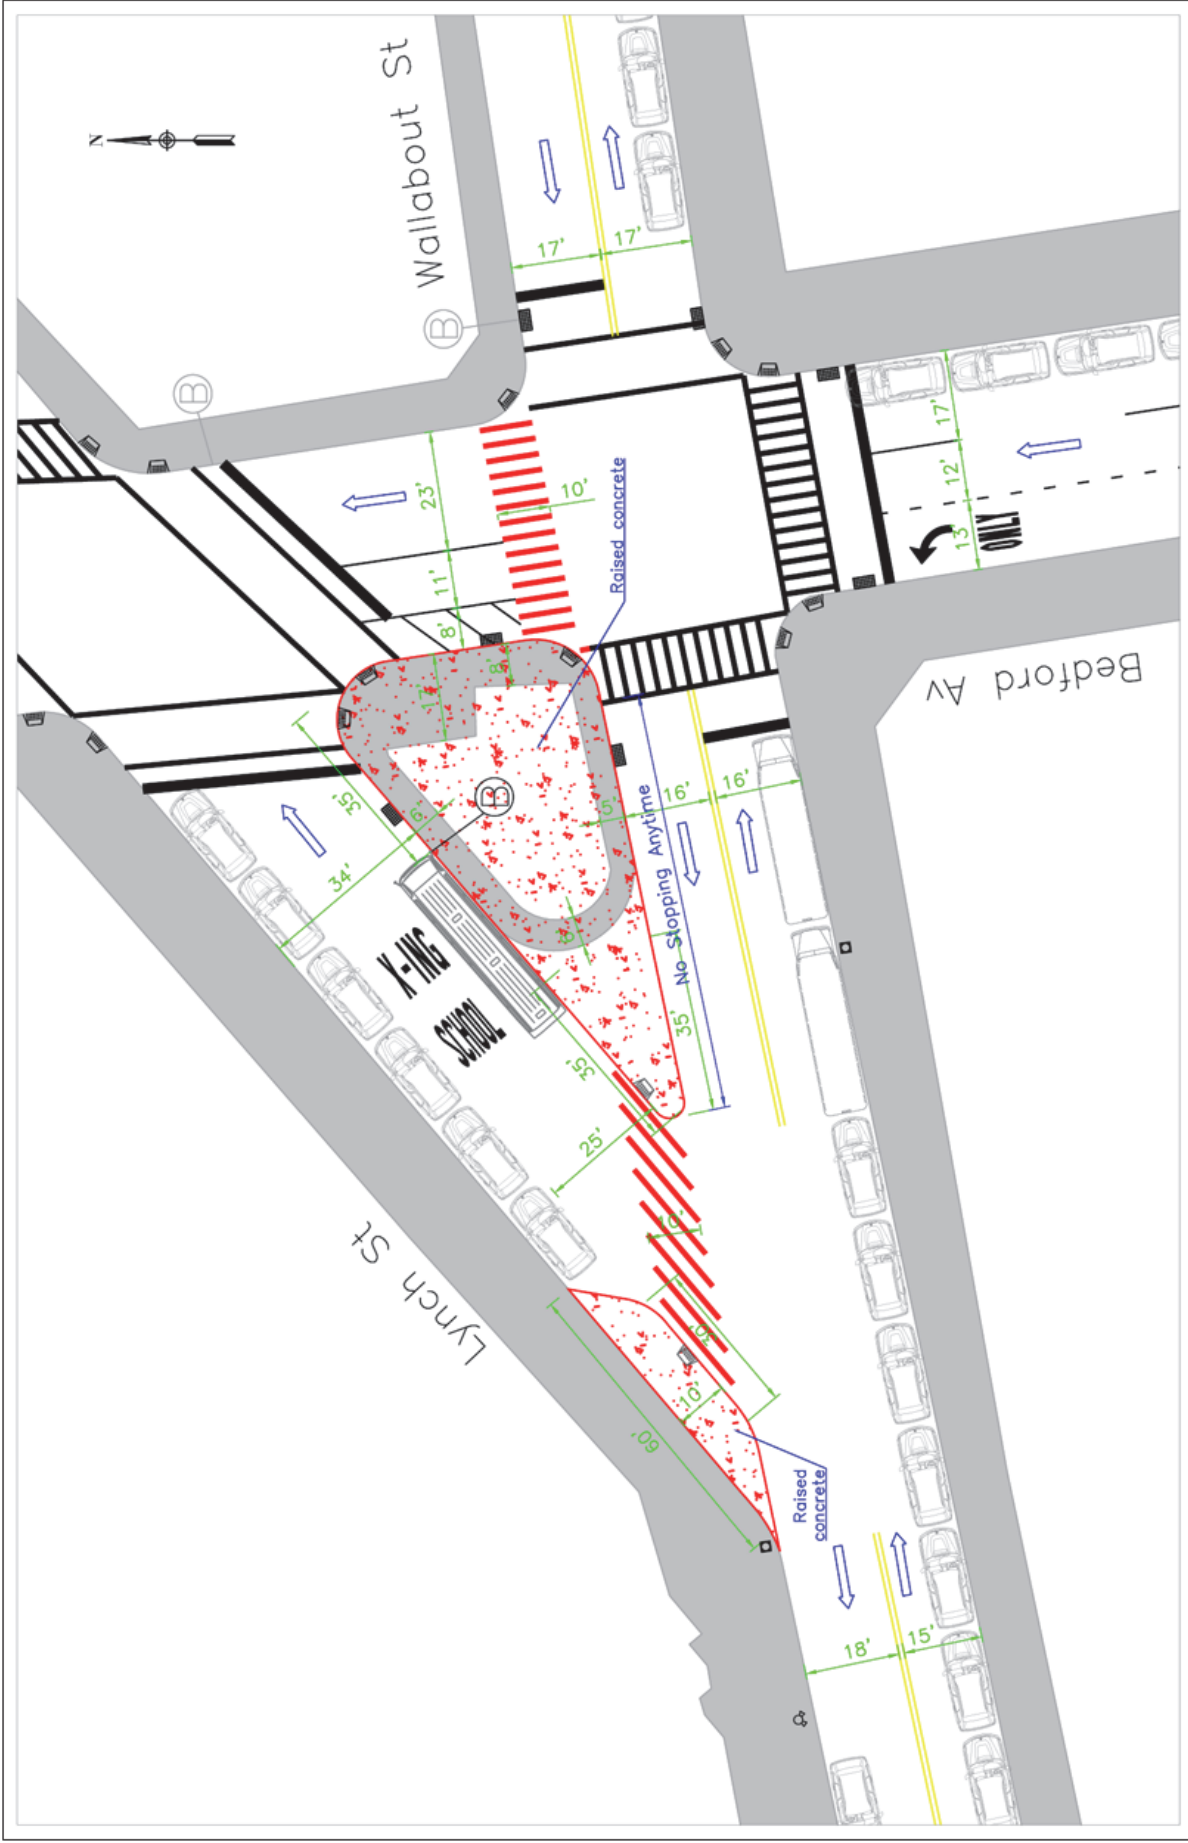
Wallabout Street and Lynch Street - Proposed
